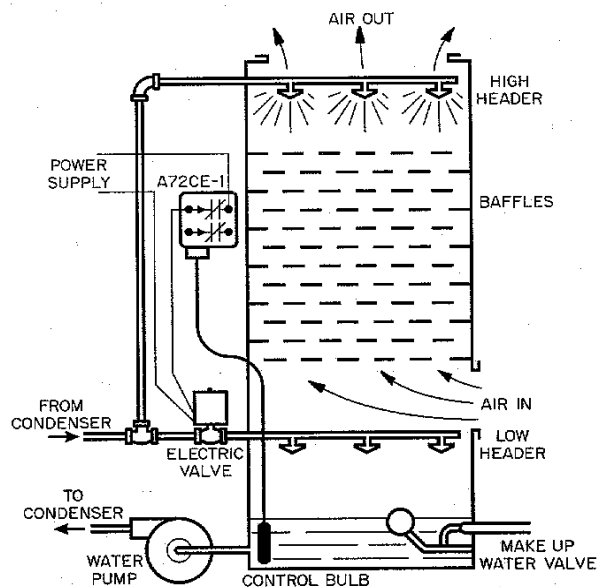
Wiring of A72CE-1 Cooling Tower Control on an atmospheric draft cooling tower.
